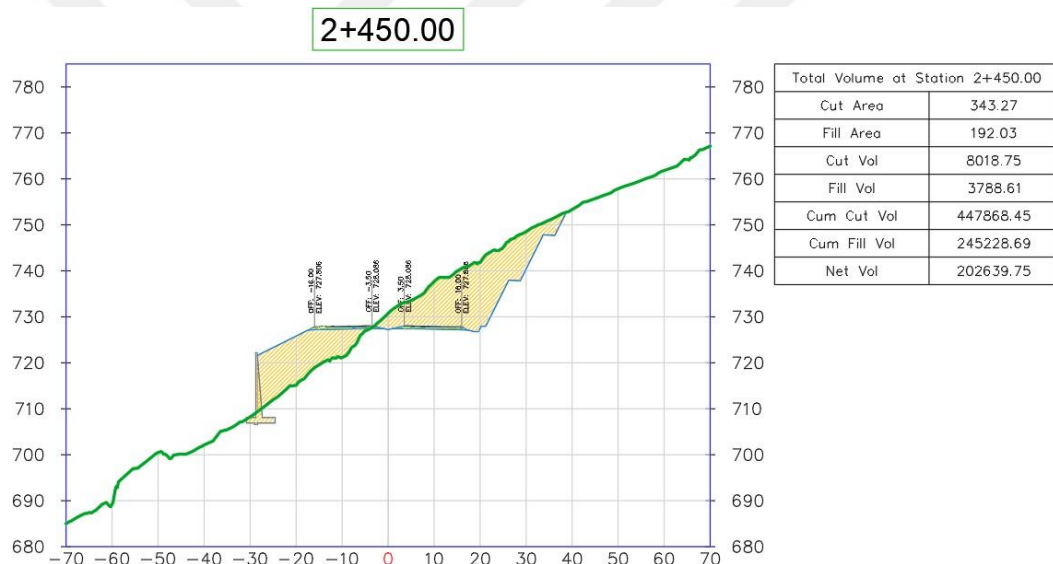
Changing the cross-section daylight to bench type and adding a retaining wall in required sections in Civil 3D software.
